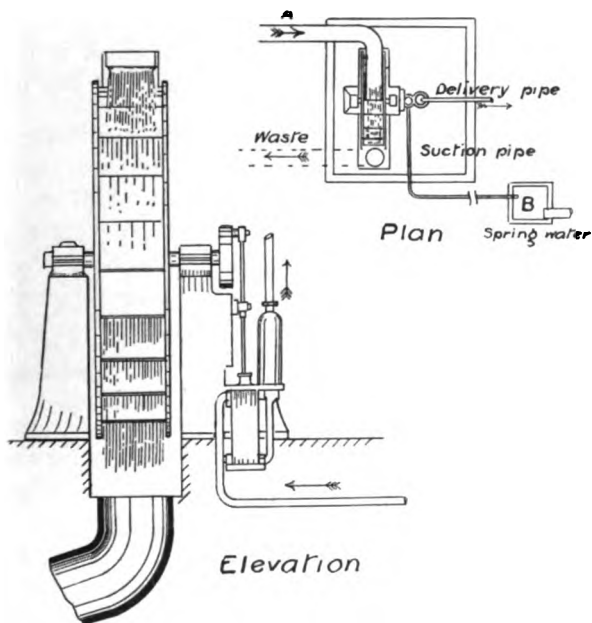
Plan and Elevation of Pump worked by Water-Wheel.
